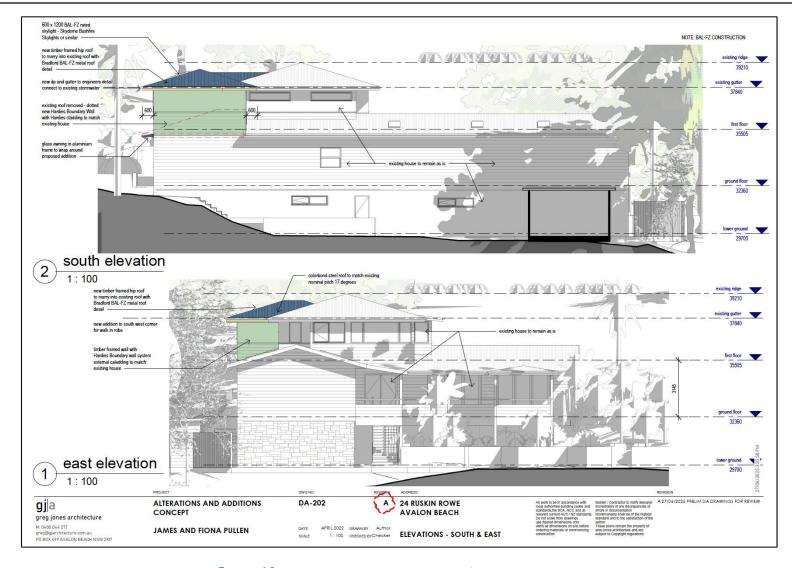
ILLUSTRATES PROPOSED SOUTH & EAST ELEVATIONS
